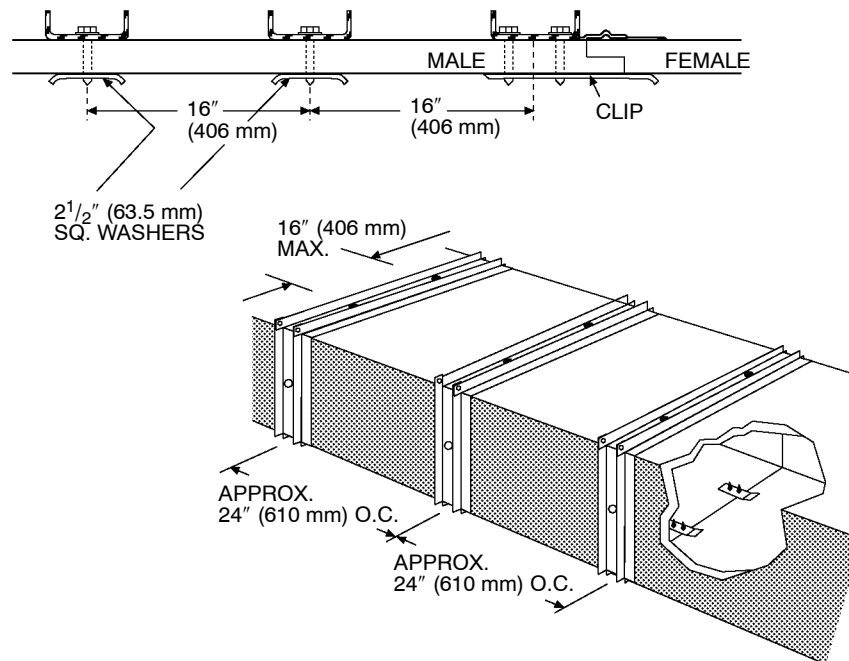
CHANNEL REINFORCEMENT ON 24-INCH (610 mm) CENTERS, 48-INCH (1219 mm) DUCT SECTION
